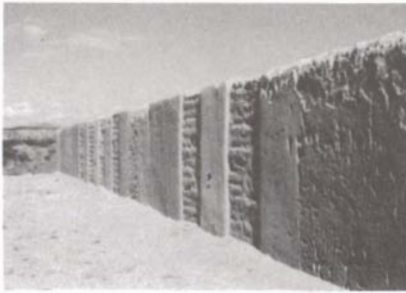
Amended wall, south face, looking west/northwest. Panel with straw is on the right.
